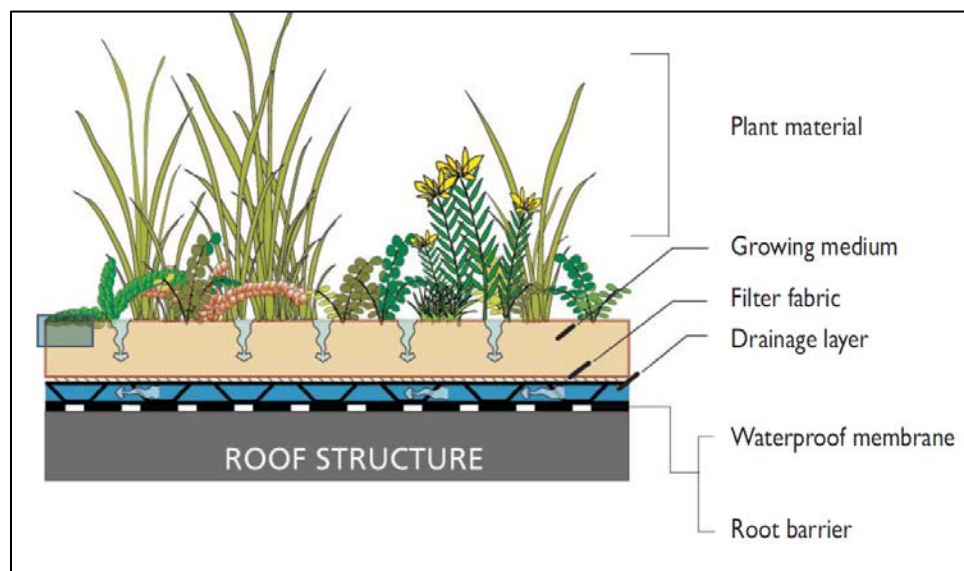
Green Roof Structure (*Install A Green Roof, 2011*)
